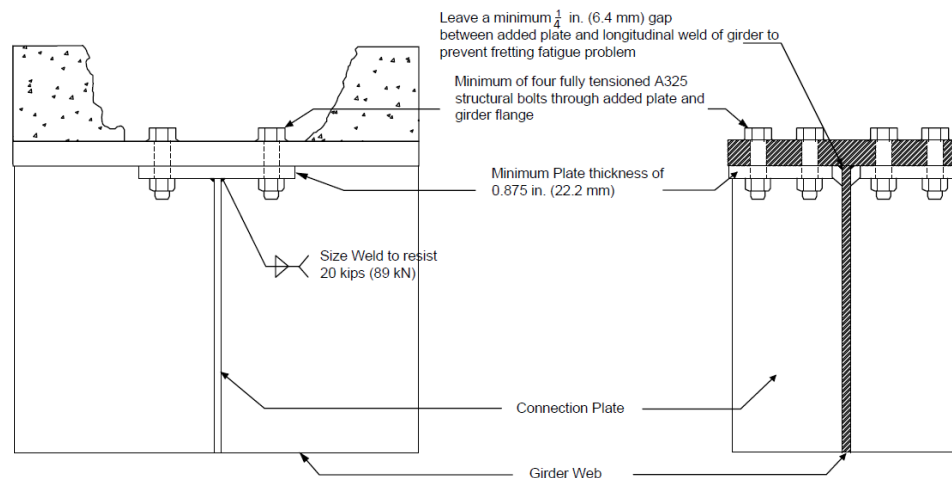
A typical hybrid connection detail (Dexter and Ocel 2013)
